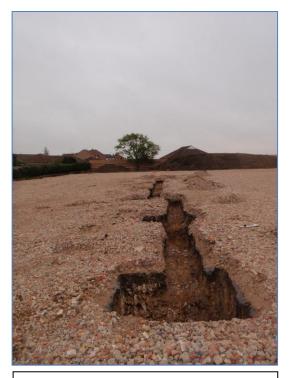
Excavation of Stanchion Bases 13-18 & linking foundation trenches, from the west
